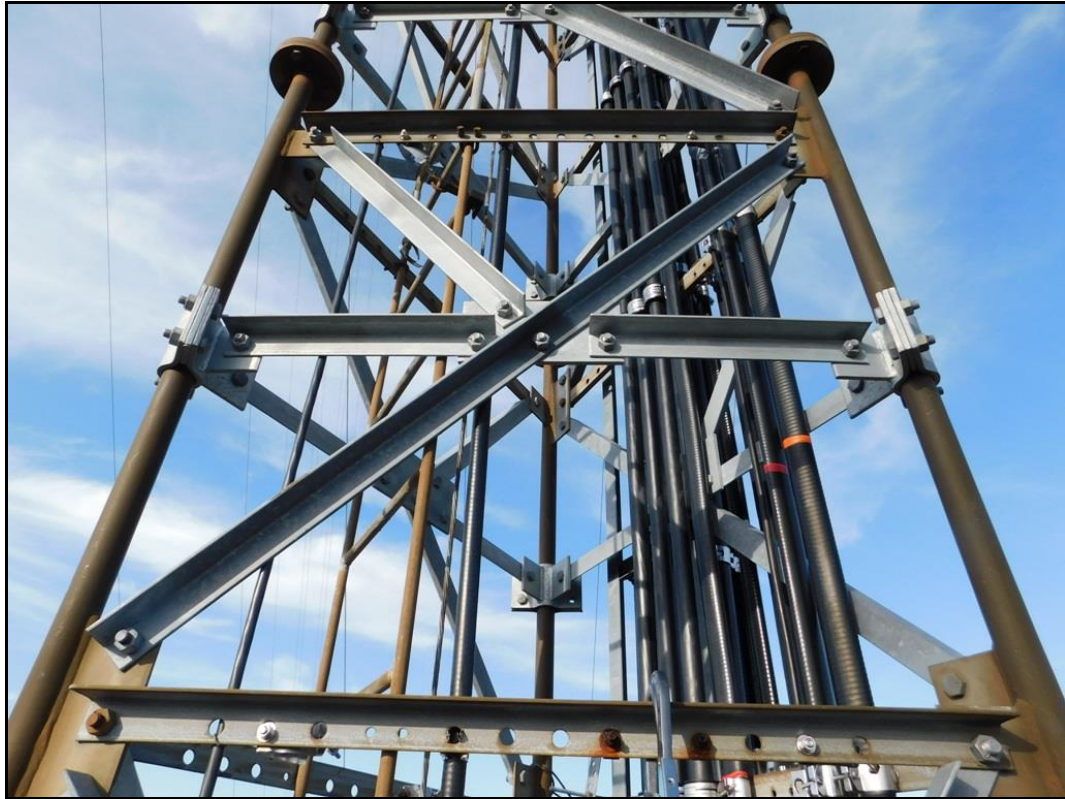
New horizontal and diagonal sub-bracing installed on the tower
